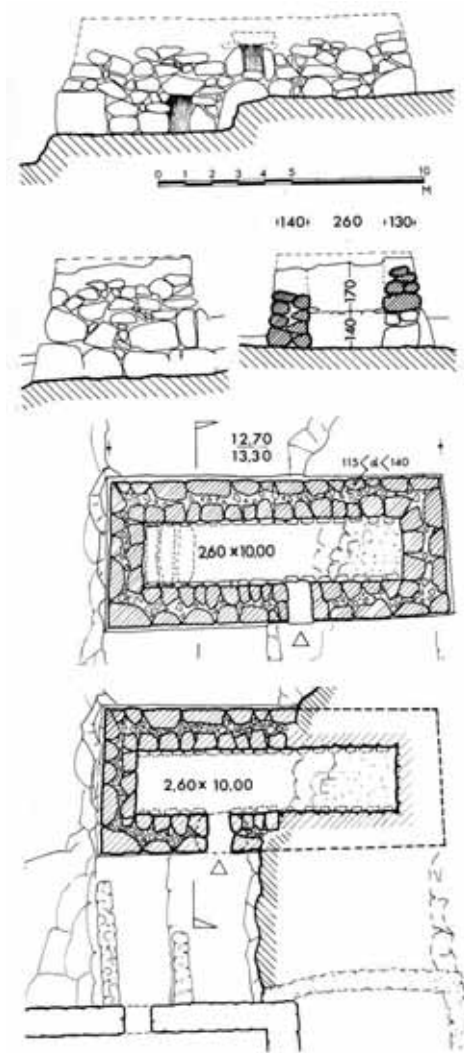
Megalithic house with a lower and an upper floor (kolospitakas, 13.0 m long) (Katamestika, Tsikalía). From bottom to top: lower level plan, upper level plan, section by width, facades (Saitas, 2001)
